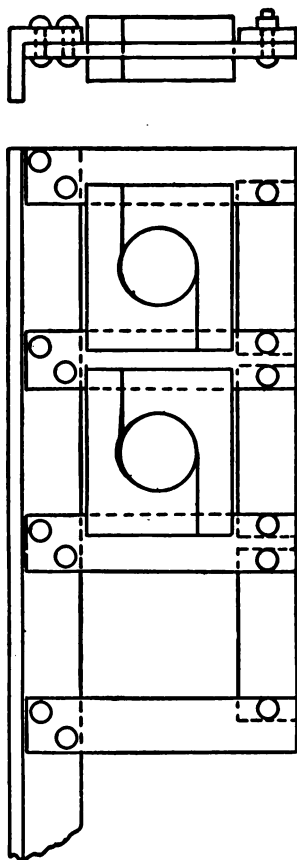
Elevation and Plan of Insulators Held in Angle-Iron Frames.
